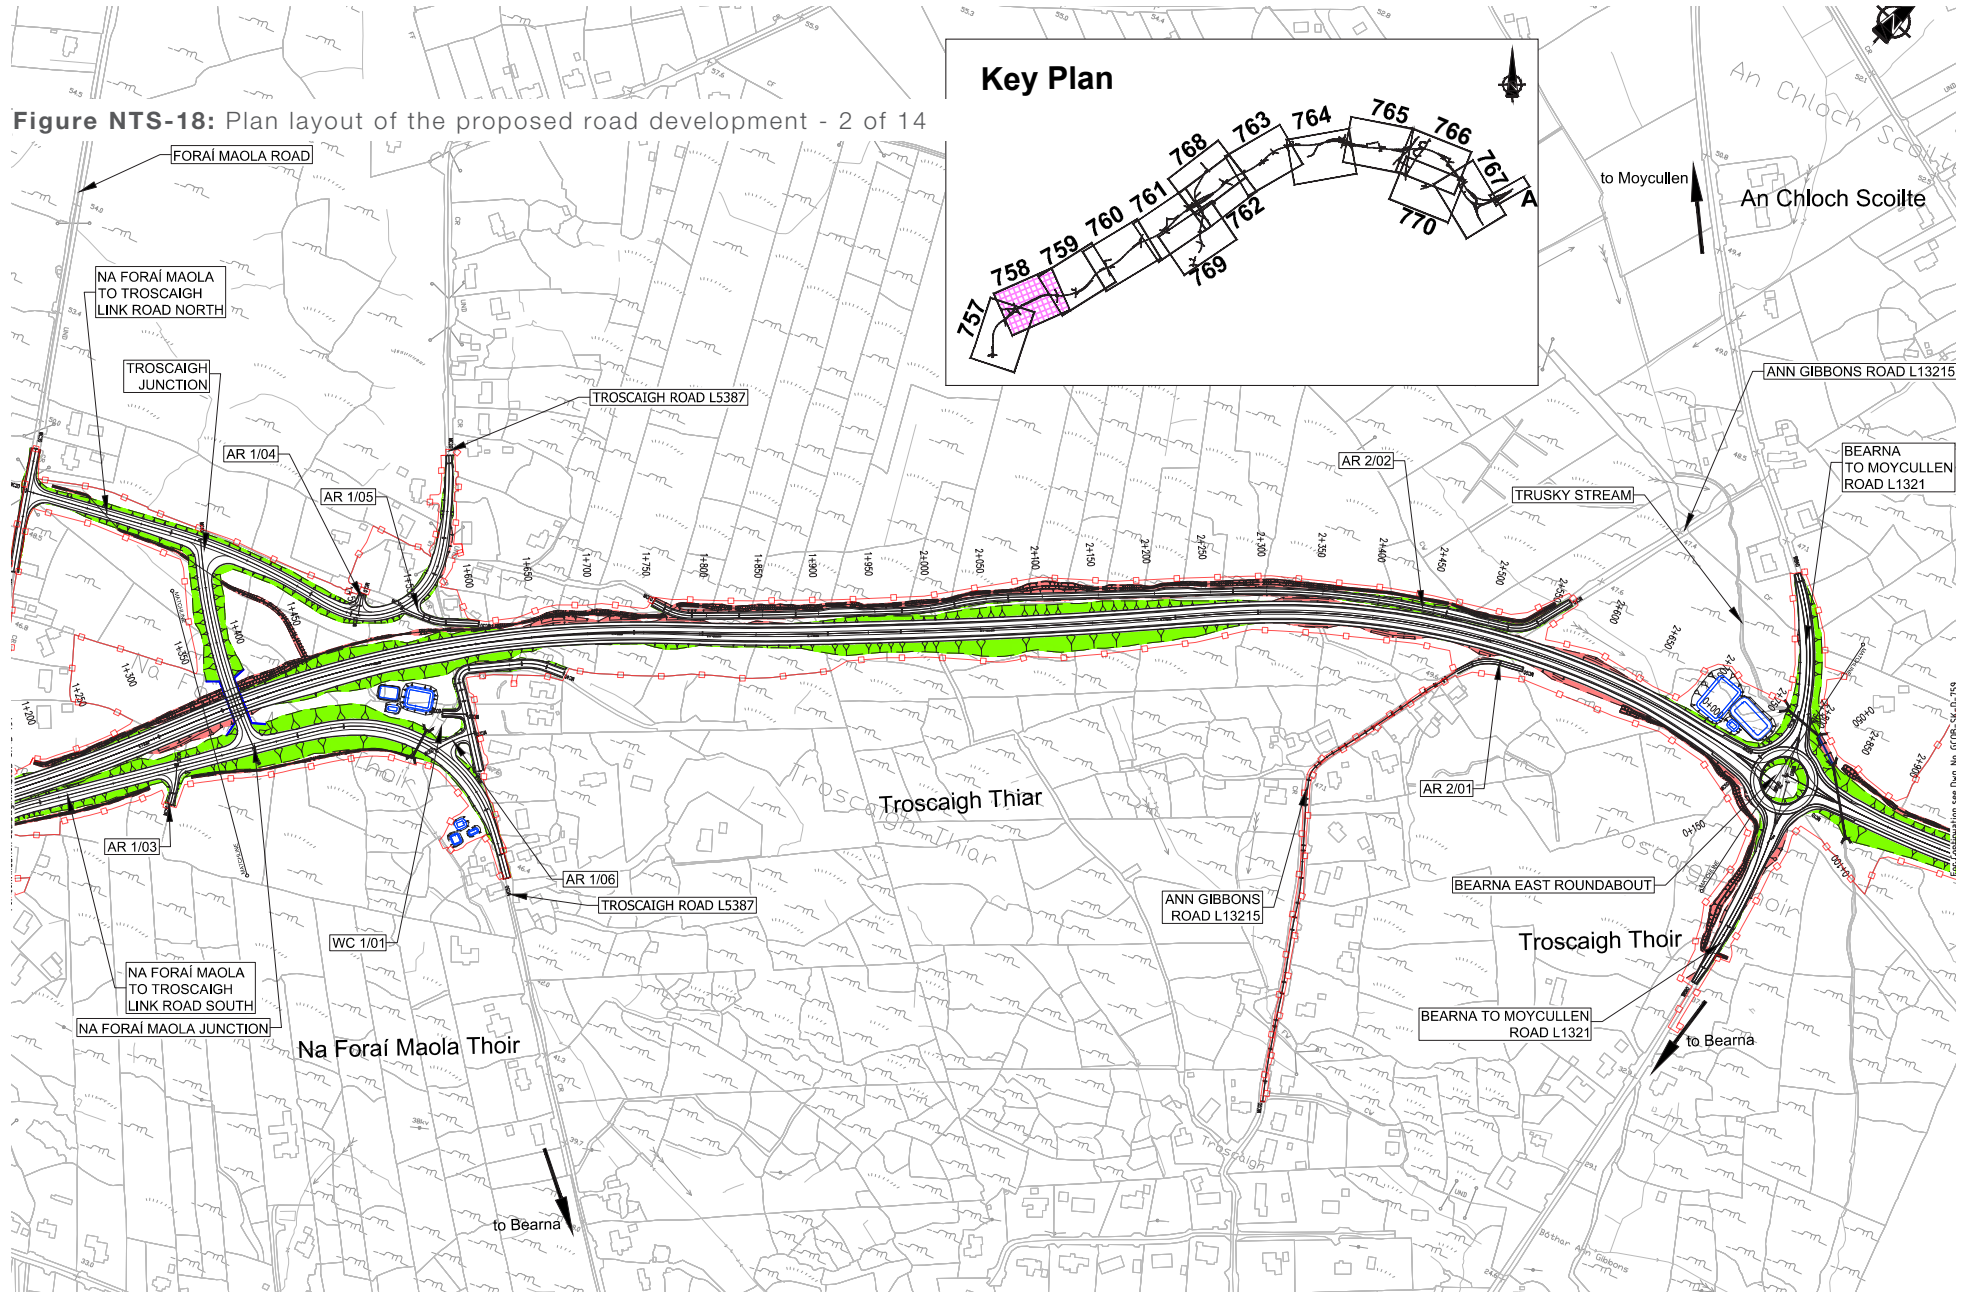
Plan layout of the proposed road development - 2 of 14
